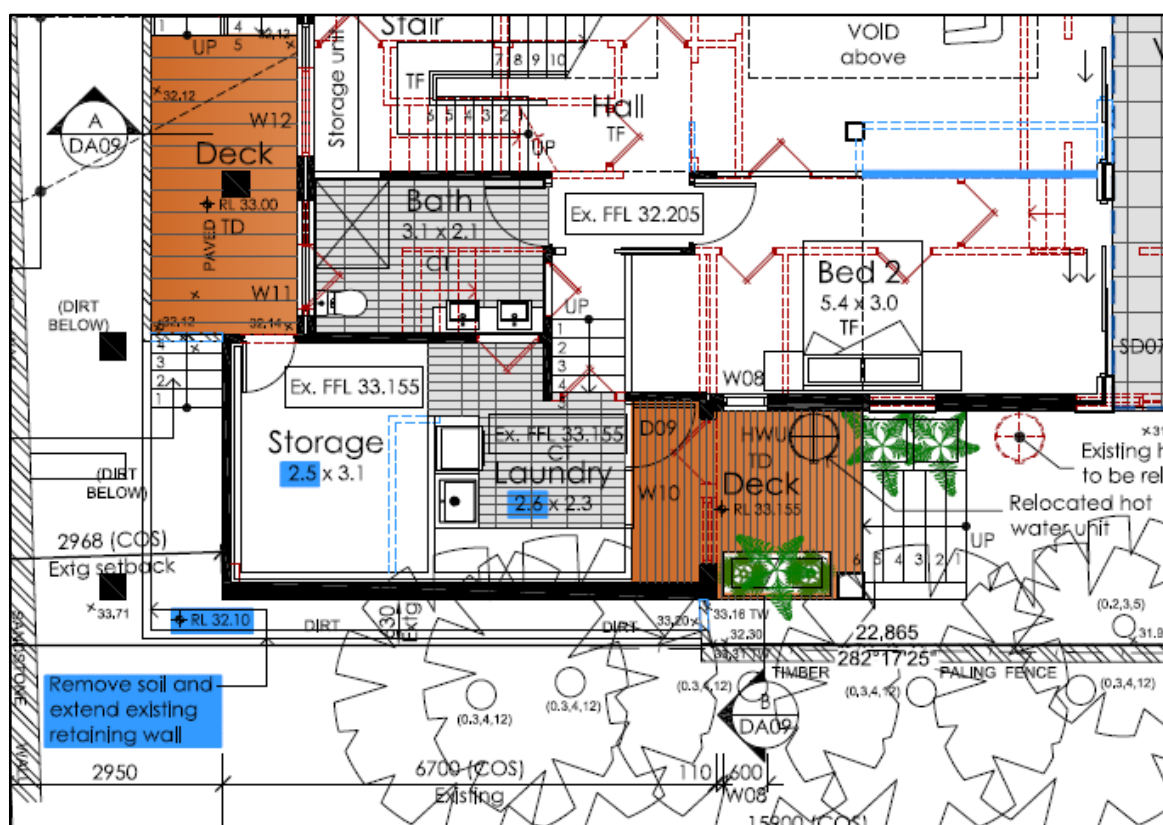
Snippet of proposed lower ground floor plan (DA/637/2019/B)
